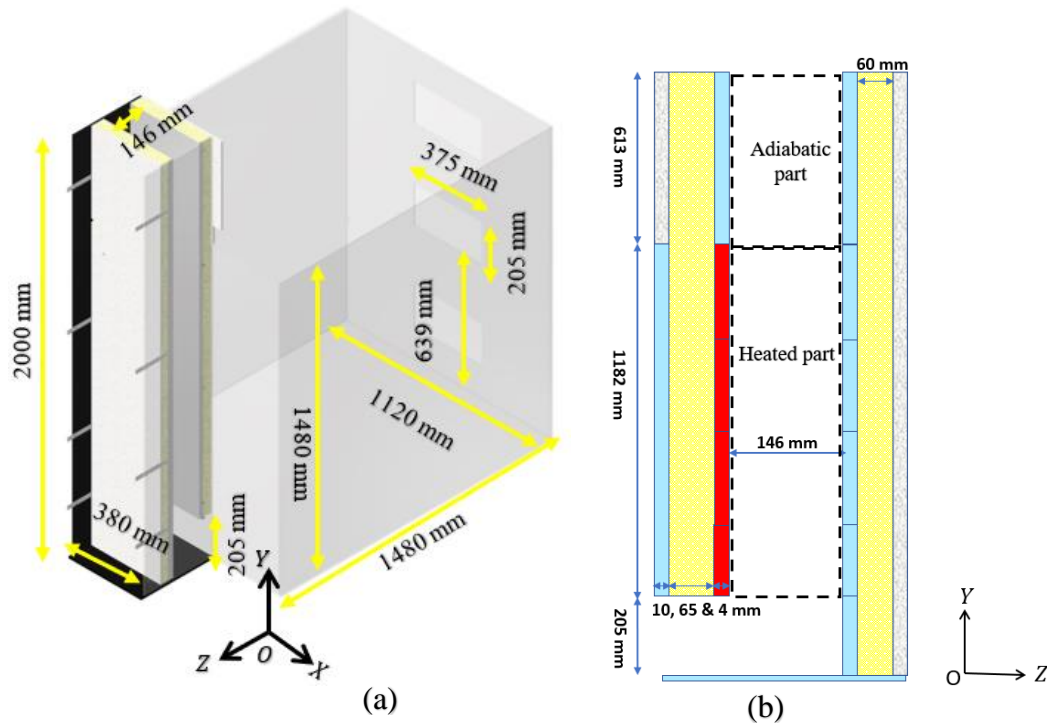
(a) 3D schematic view of indoor wall-mounted solar chimney (b) 2D view of the L-shaped vertical channel
